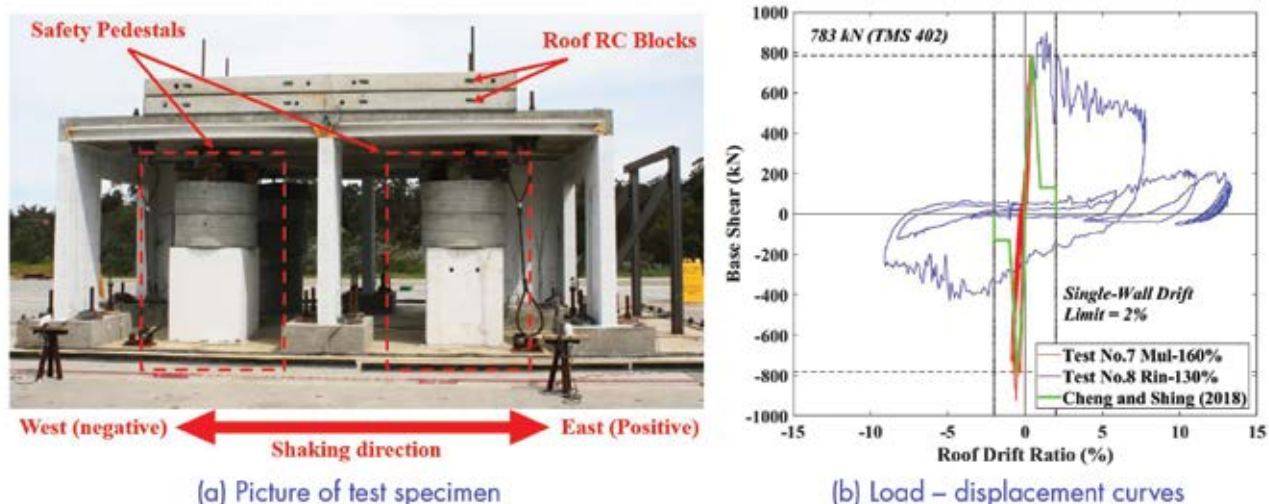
Reinforced masonry wall system (Specimen 2) tested on the outdoor shake table at the University of California, San Diego.
